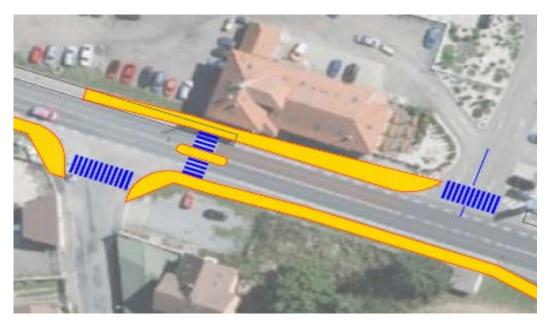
Proposed safety upgrading countermeasures – crossing upgrade (refuge island, new crossings on sides)
